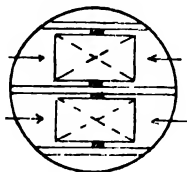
Arrangement of Wood Guides when Cage carries One Tub on a Deck
